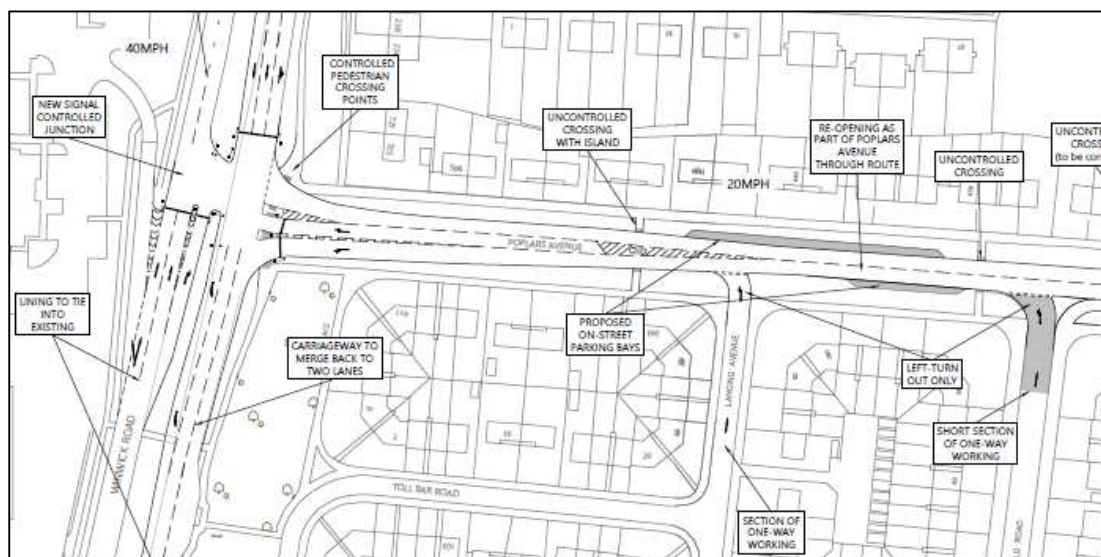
Illustrative internal road layout and site access locations (Option B)
